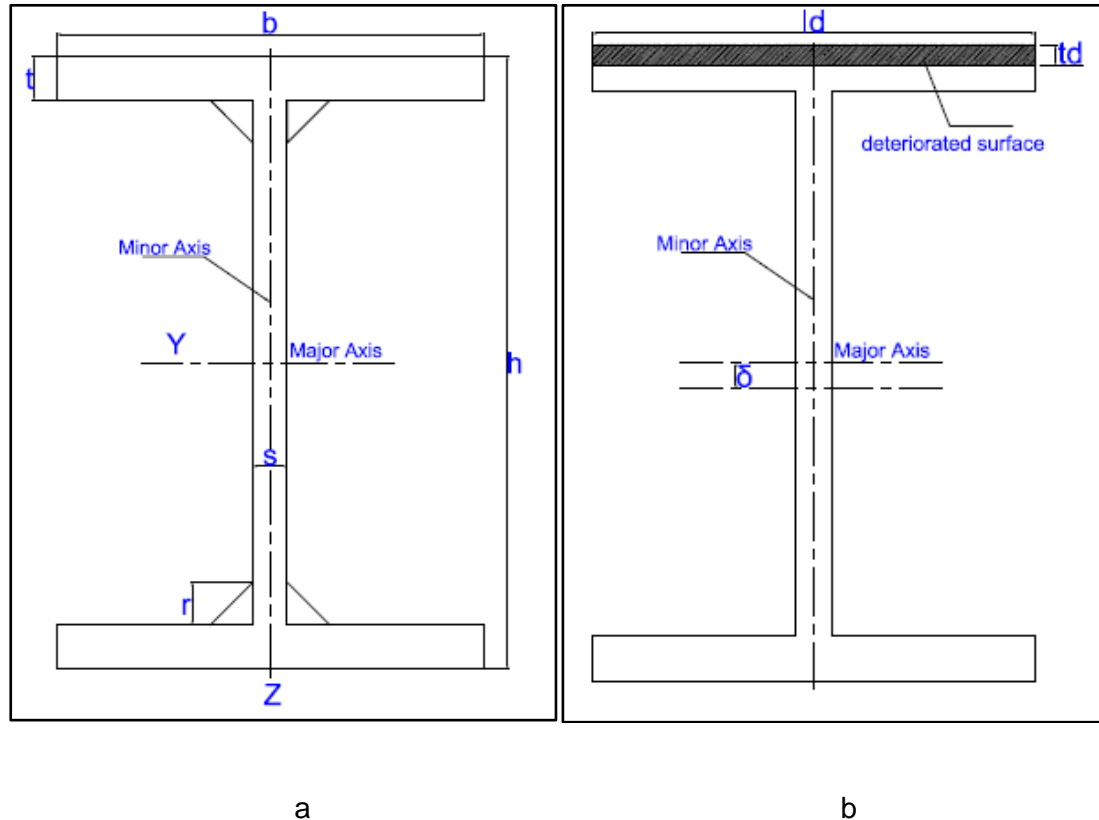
(a) Initial I- Section and (b) Deteriorated I-Section model
